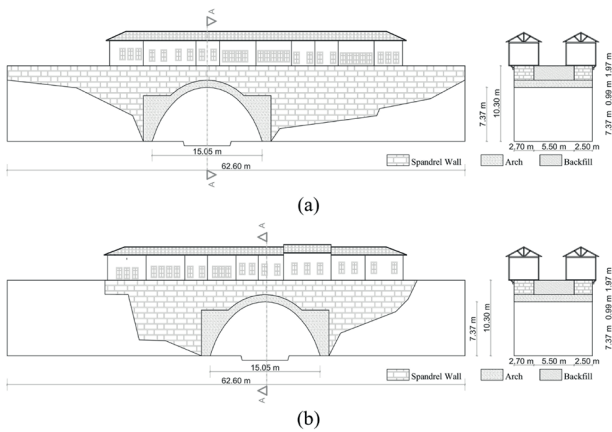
Façade of Irgandi Bridge (a) Downstream façade, (b) Upstream façade
